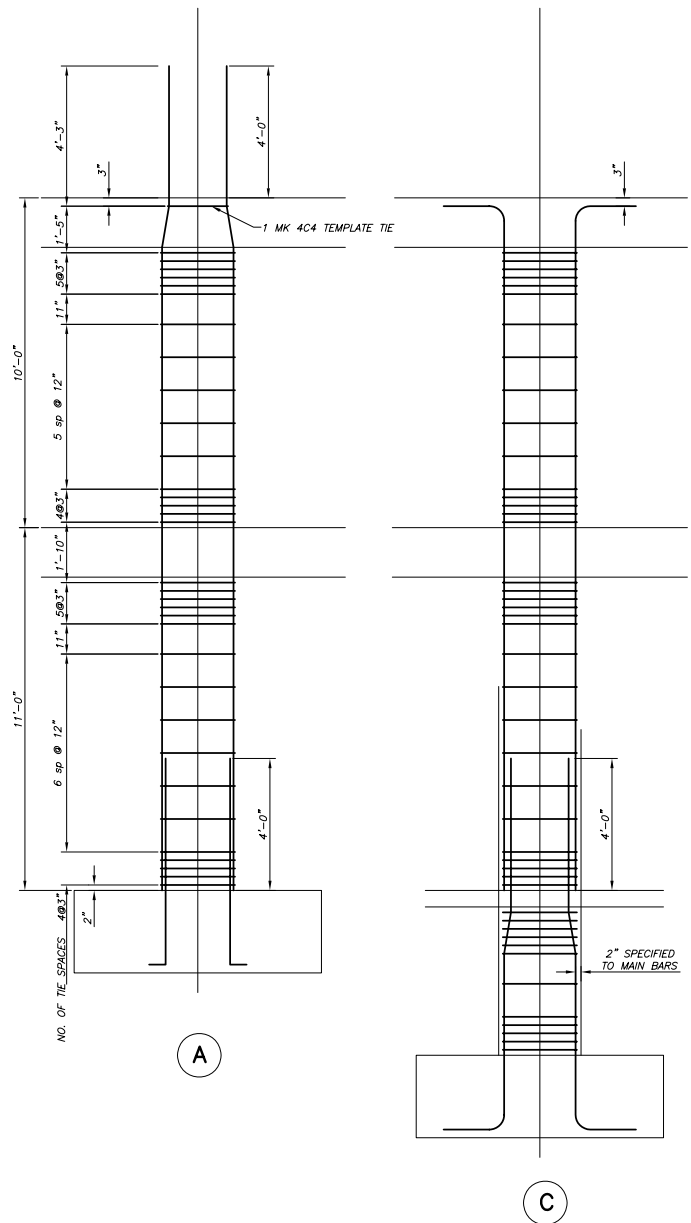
Typical column details, showing bar offsets and distance from longitudinal bar ends to first and last tie (1 ft = 0.3048 m; 1 in. = 25.4 mm)
